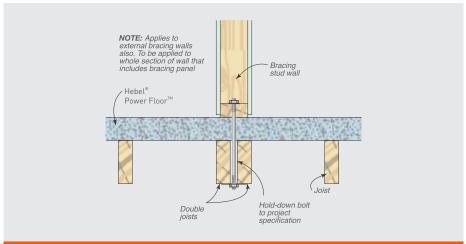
Hold-down of Internal Bracing Wall Parallet to Joists on Platform Floor.
